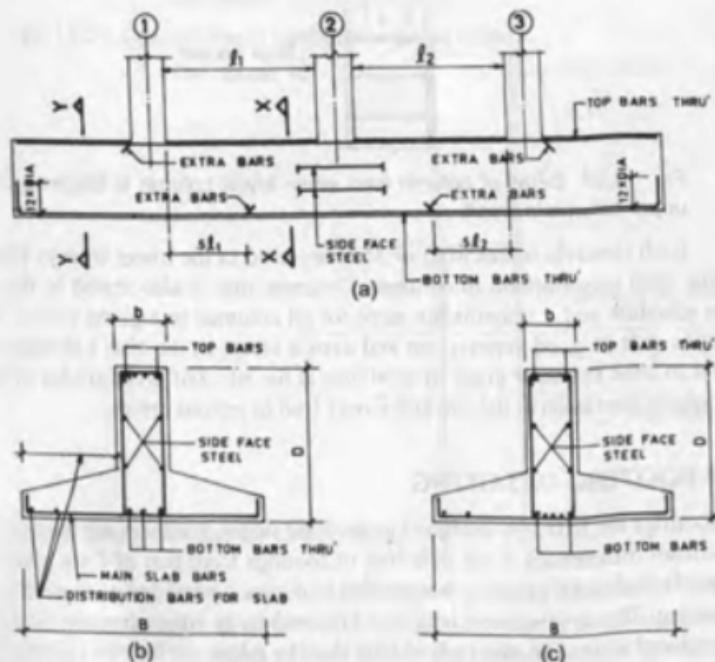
Detailing of strip foundation. (a) Elevation; (b) Section X-X; (c) Section Y-Y.
